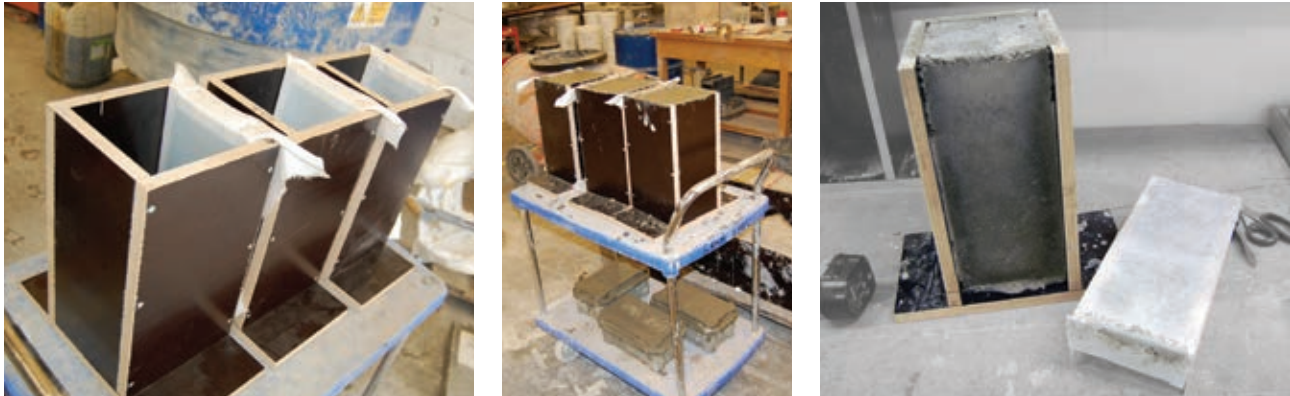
Three Series 2 moulds (l); Casting (c); Demoulded prisms (r).
